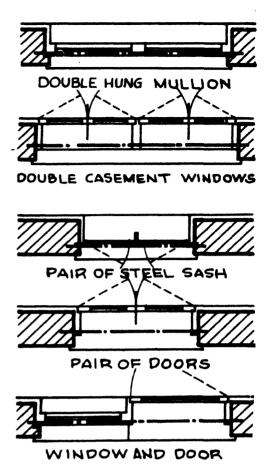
PLANS OF DOORS AND WINDOWS IN
